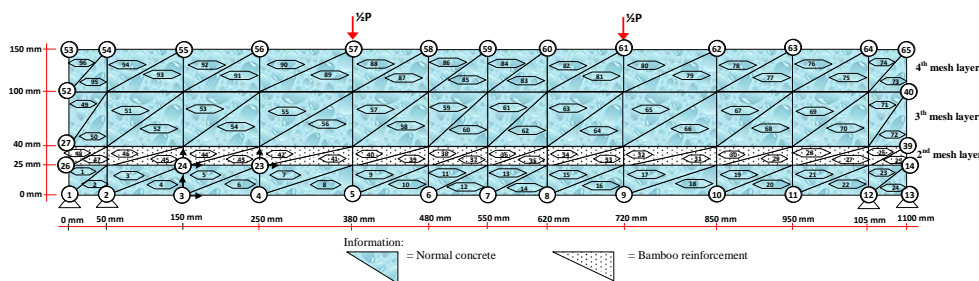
Discretization of the triangular element on the bamboo reinforced concrete (BRC) beam.
